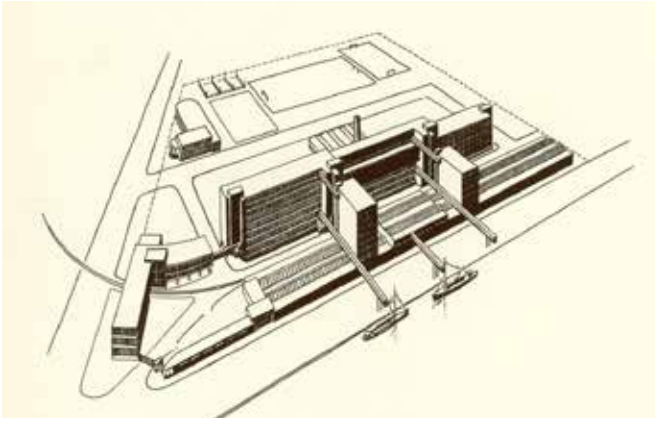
The 1926 masterplan for the new Van Nelle plant guided the factory's construction until 1931 / *Brinkman & Van der Vlugt Architects – Het Nieuwe Instituut
